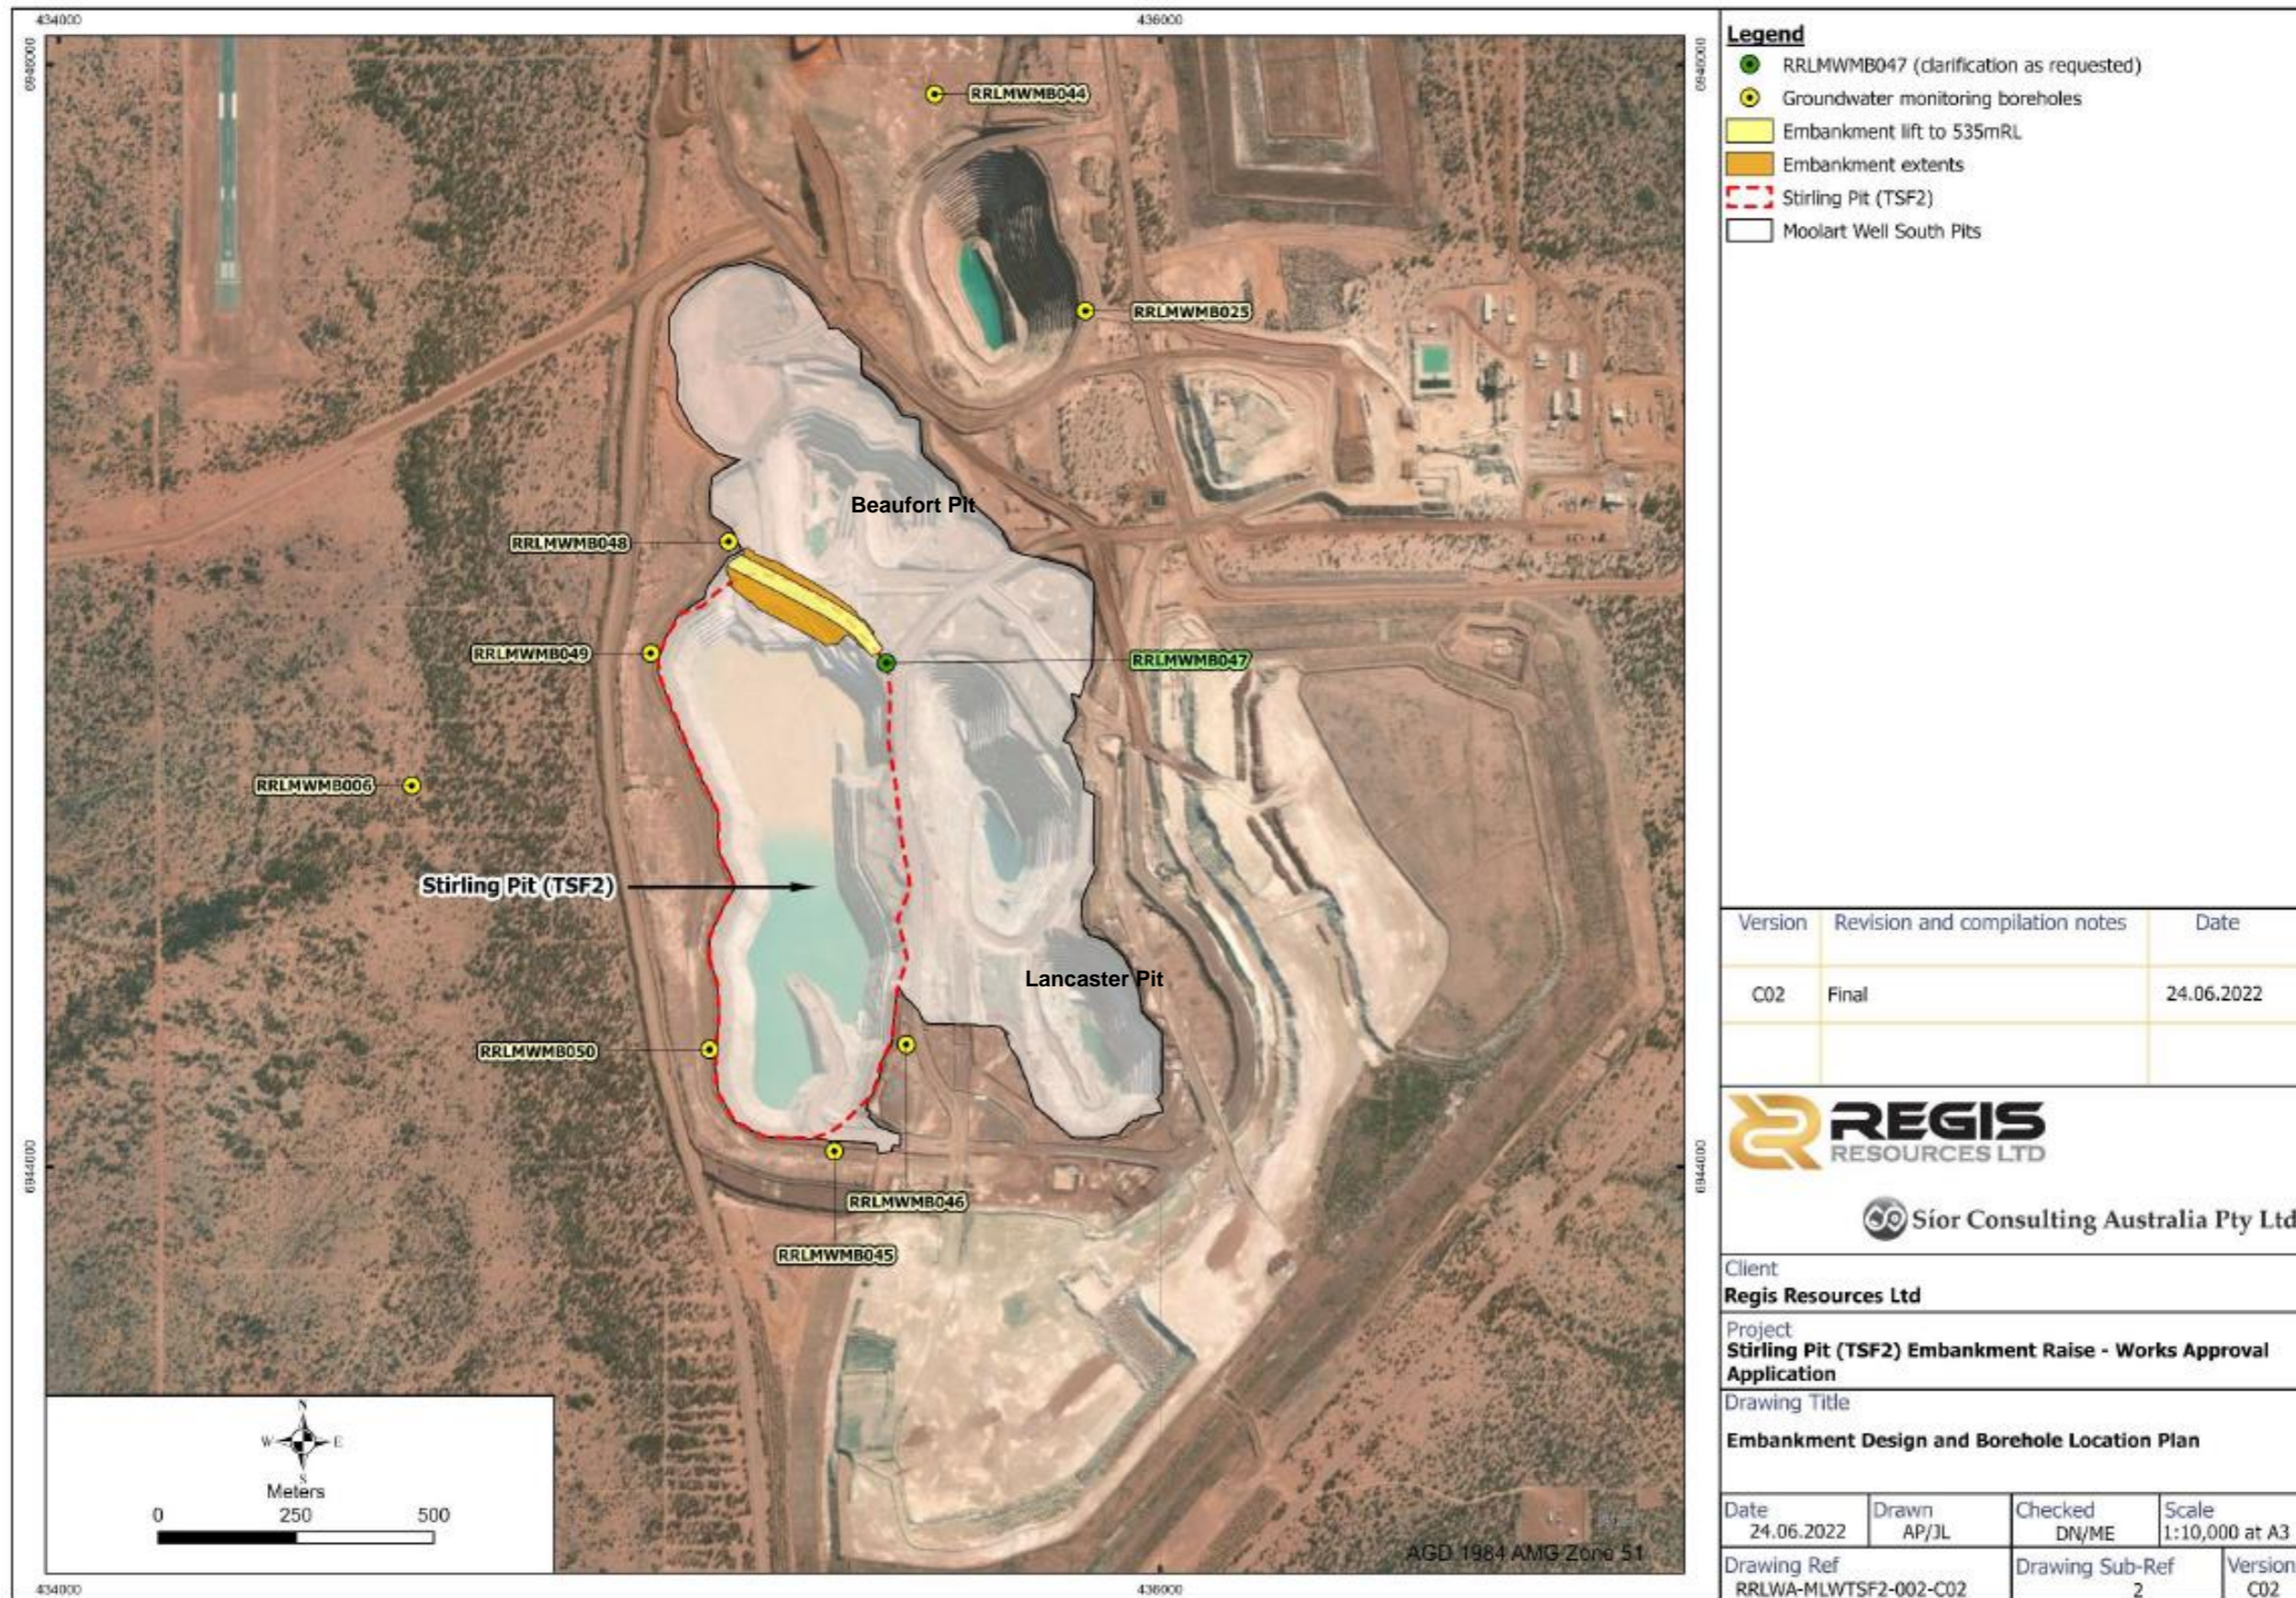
The location of the Stirling in-pit TSF and the proposed embankment raise
